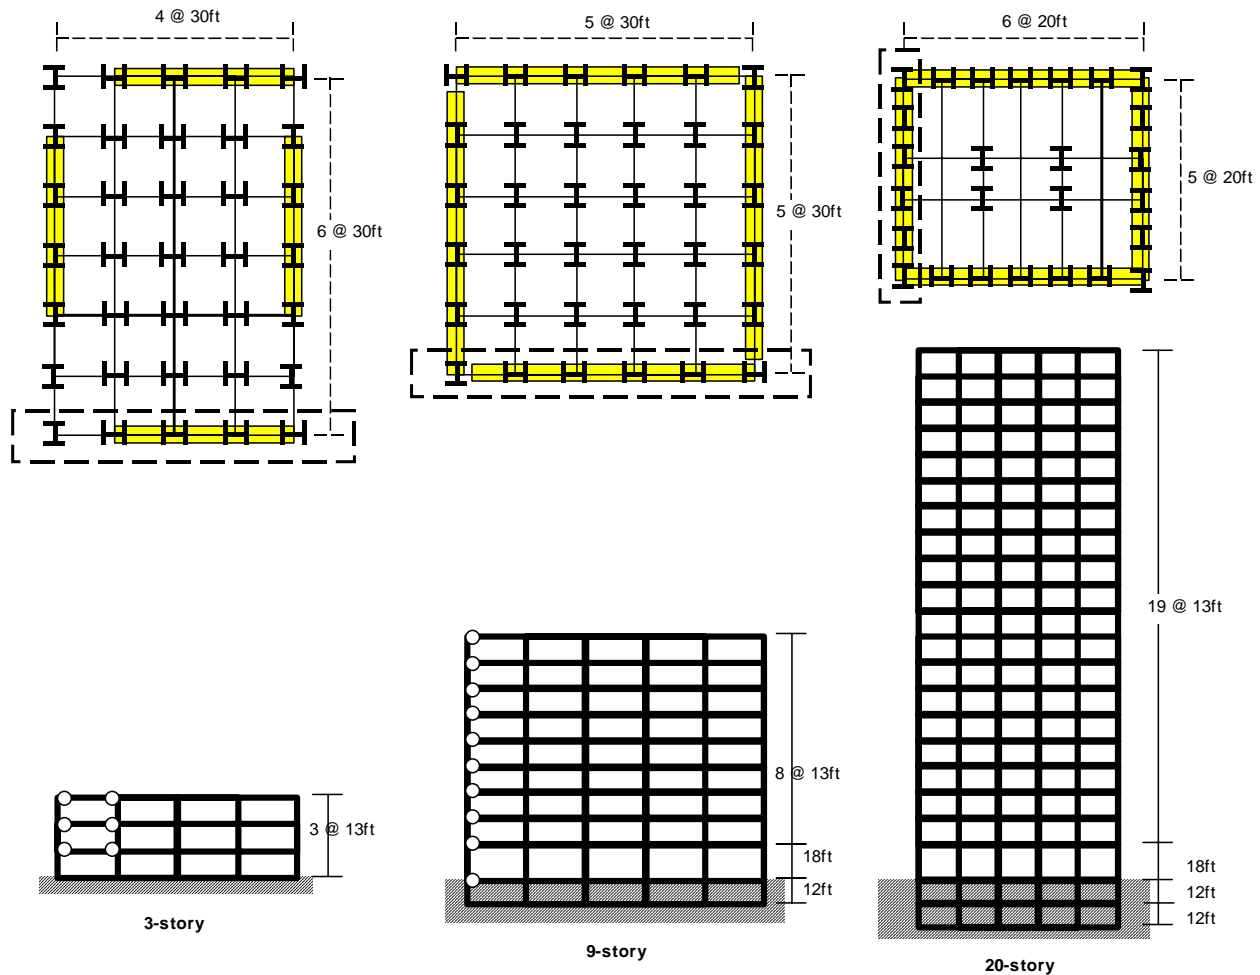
Plan and Elevation View of the 3, 9, and 20-Story Buildings Designed According to the 1994 UBC
